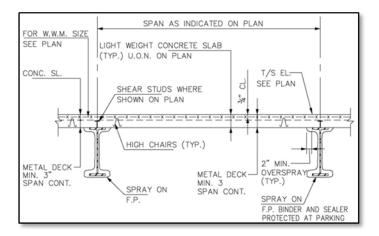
Typical Floor Construction, Metal Deck Perpendicular to Floor Beams on Girders
